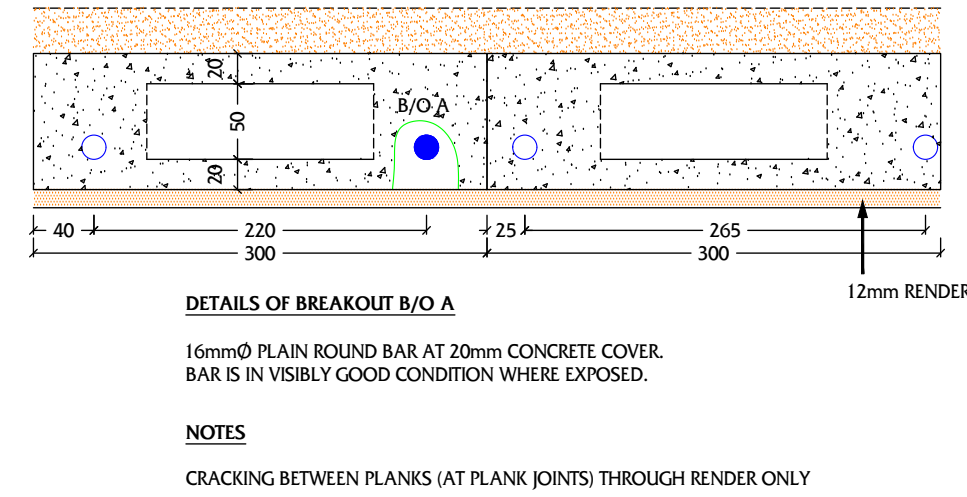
PART SECTION LOOKING EAST THROUGH 1ST FLOOR PRIMARY BEAM - SURVEY AREA L-K/2-3 SCALE 1:5
